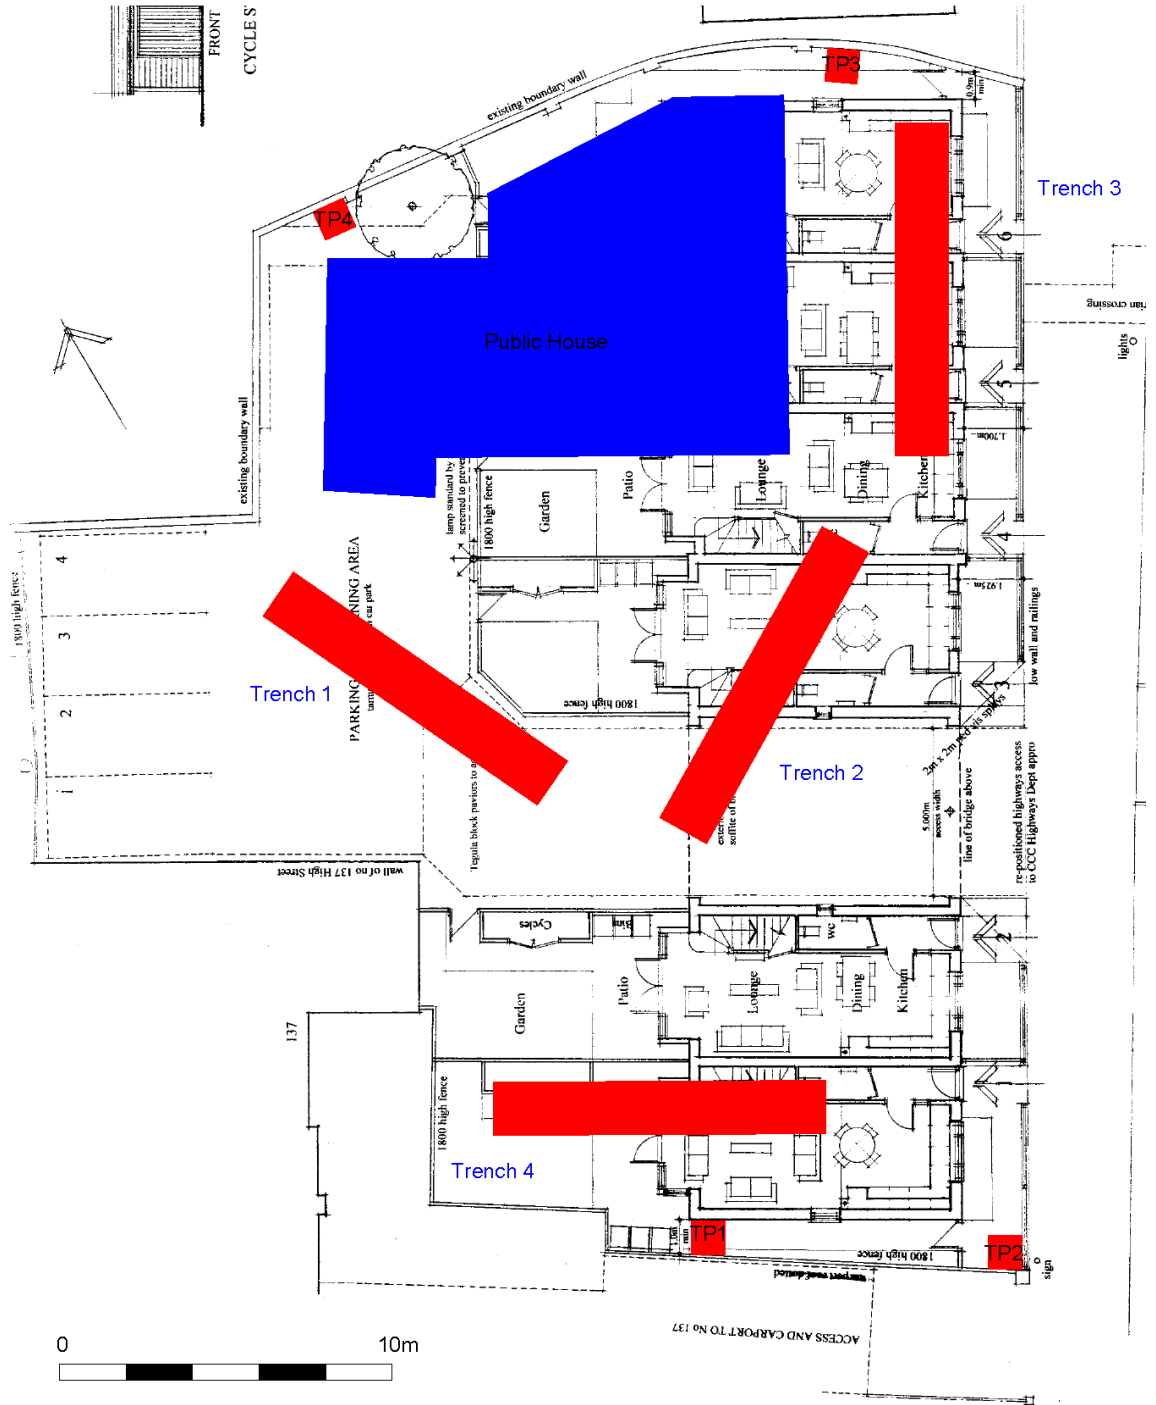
Proposed development with trench and test pit locations (scale 1:200)
